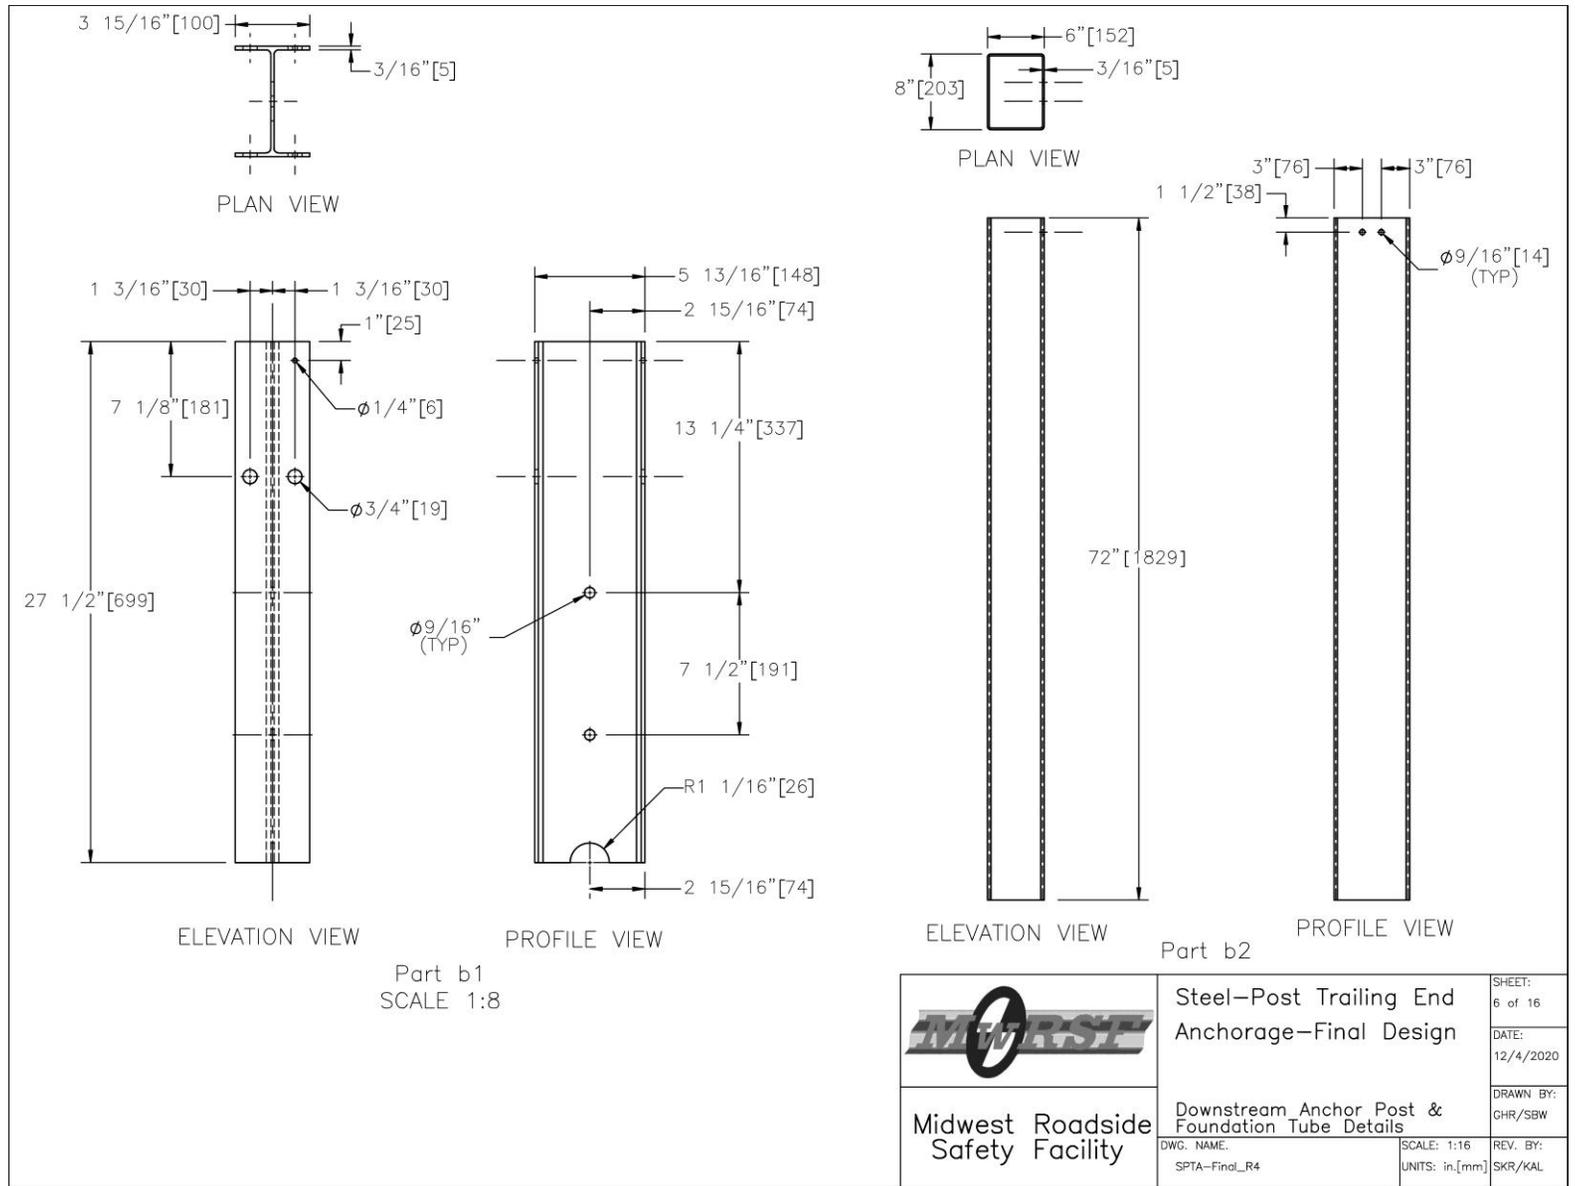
Steel-Post Trailing End Anchorage, Downstream Anchor Post and Foundation Tube Details
